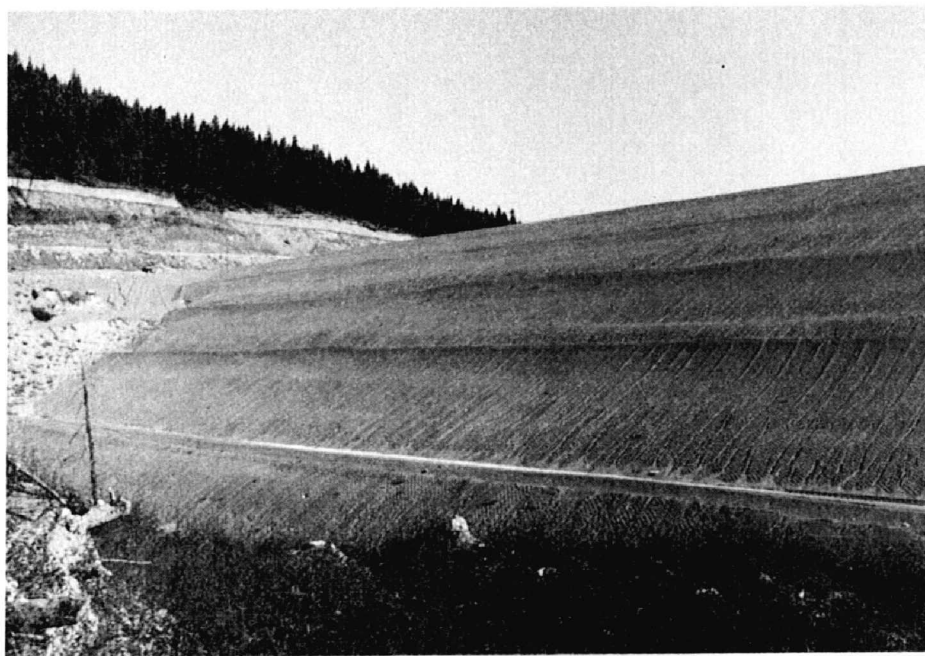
Downstream Face Looking Towards the West (8-13-81)
